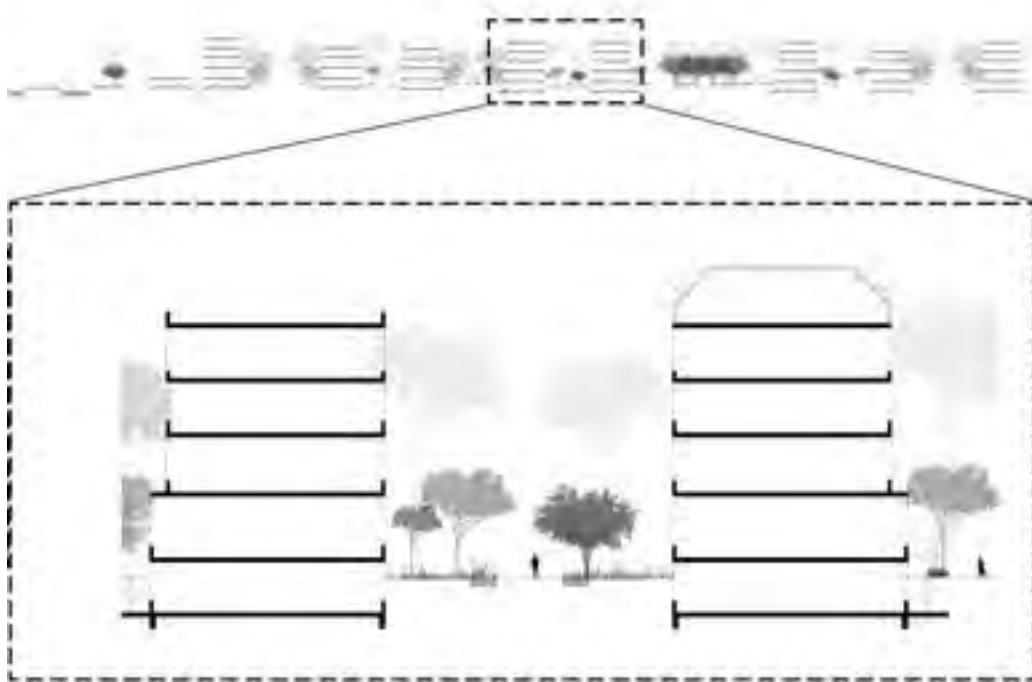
PROPOSED SECTION CUTTING PERPENDICULAR TO COMMONWEALTH AVENUE, PHOTO CREDIT: YIWEI HUANG
